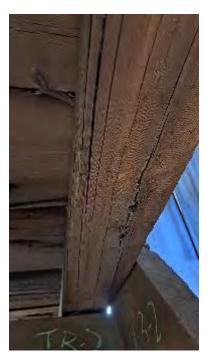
J2-8 has vertical cracks to the bottom face, extending to the North side.
